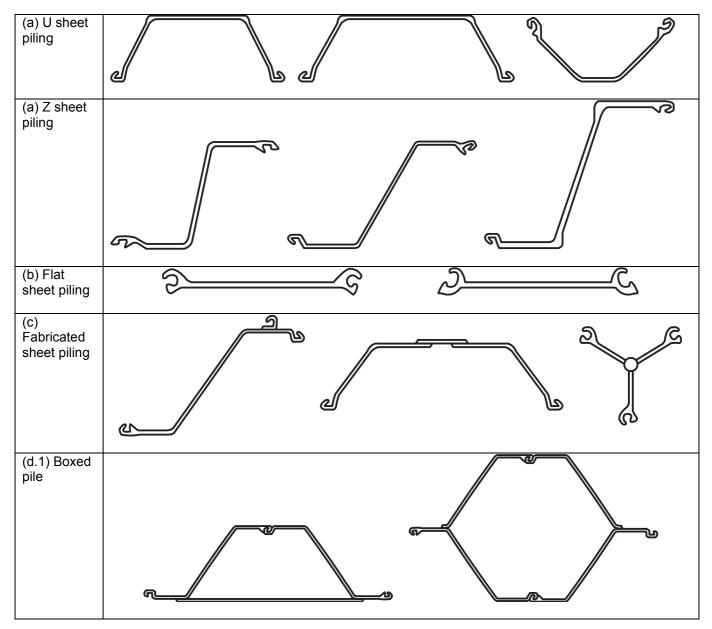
Illustrations of typical sheet piling (see 3.4.7.2.1)
